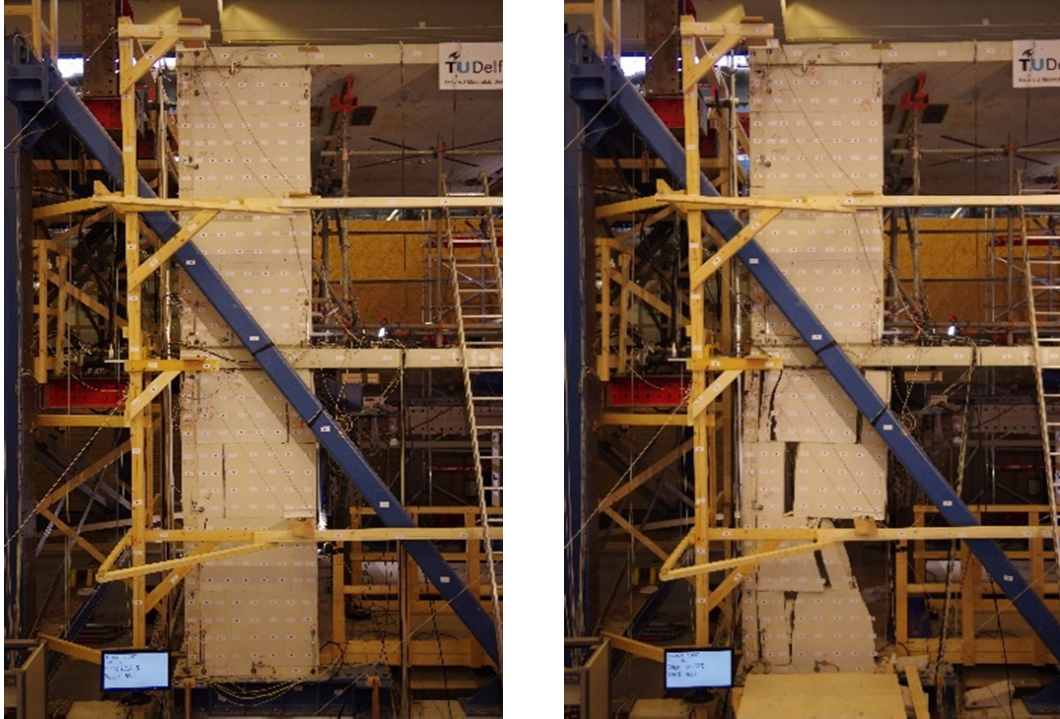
Cracks in pier P1 in C17b (left); Partial collapse of pier P1 in C21 (right);
